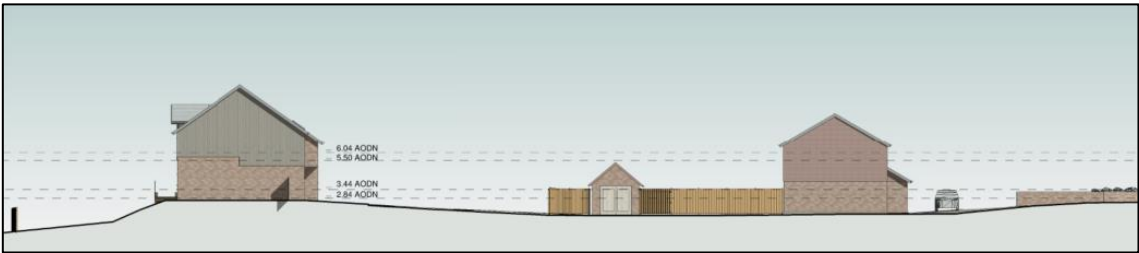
Proposed side elevation and site section (1/2 Willop Close to right, proposed house to left)
